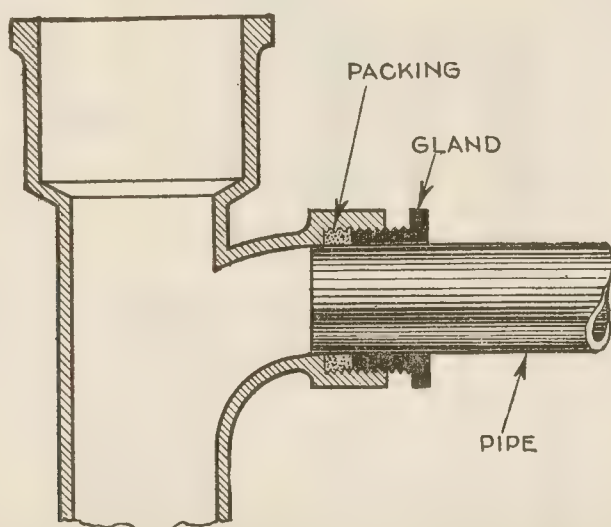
,113.—U. I. W. combined soil and packed drainage fitting with trap or other connecting pipe in position showing packing box joint.
